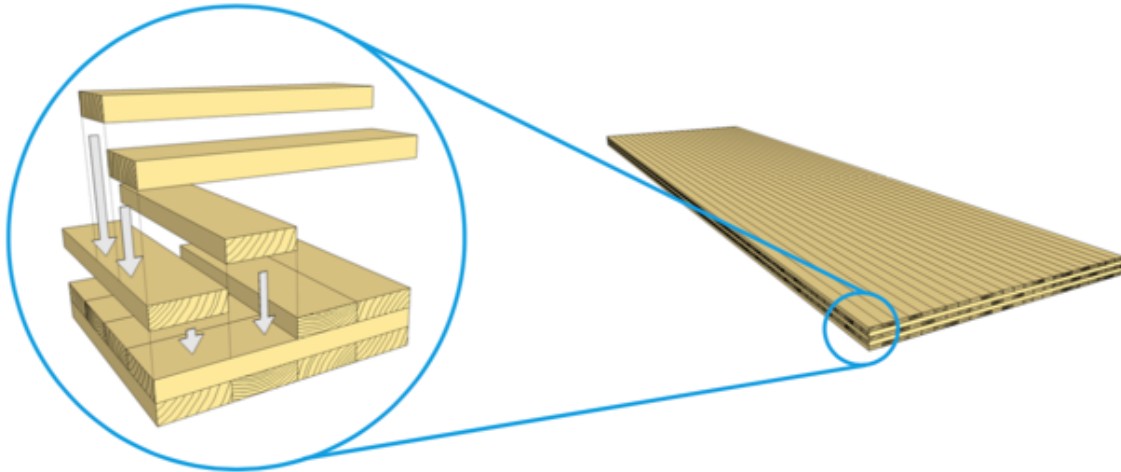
Detail of Cross-Laminated Timber Panel [17]
